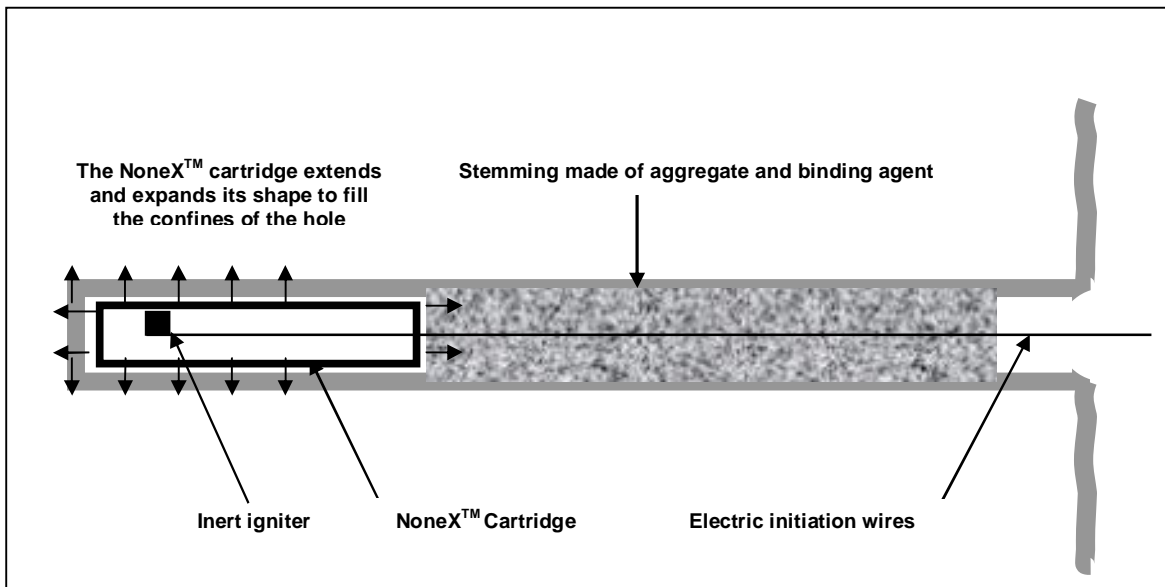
The NoneX™ Cartridge inserted in a drill hole
